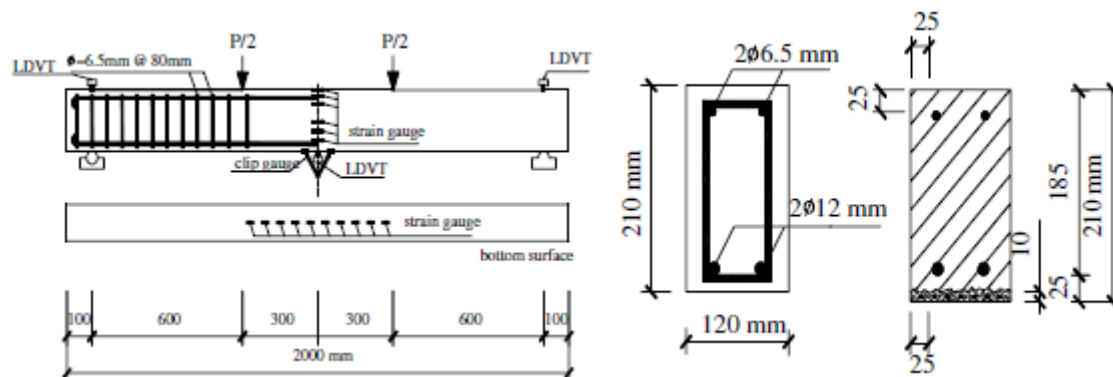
Testing configuration and cross-section of the beams (S. Yin and S. Xu, 2014)
